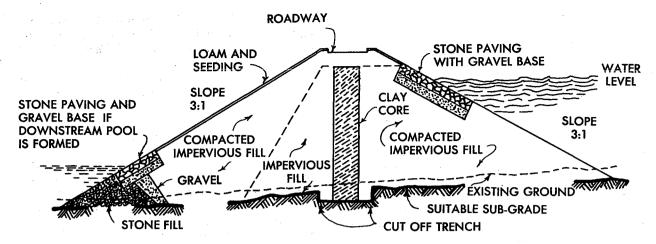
Plans for construction of a typical clay core dam (Atlantic Waterfowl Council 1972).
